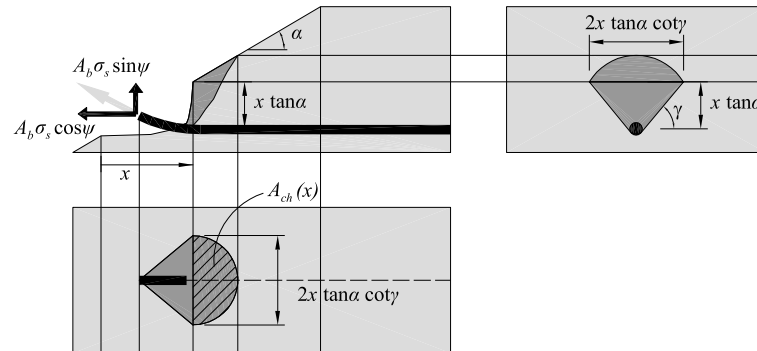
Proposed model for the progressive destruction of concrete over reinforcing bars
